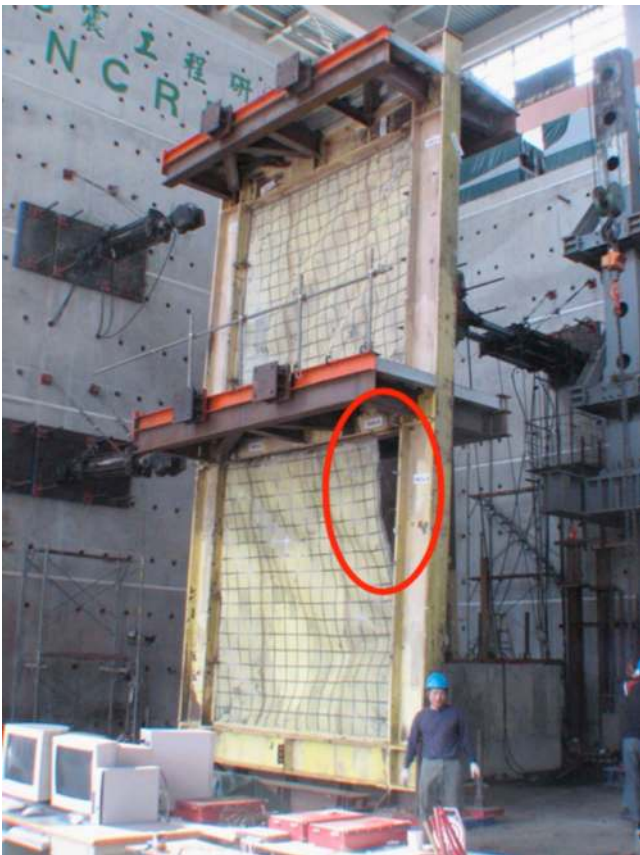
Fractures of welds connecting infill panels to fish plates
